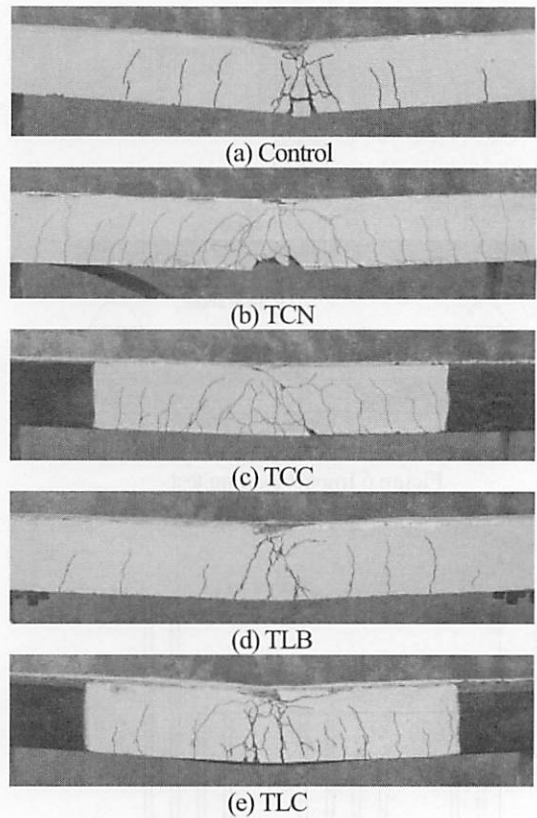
Failure modes at a drop height of 400mm in single impact loading test
